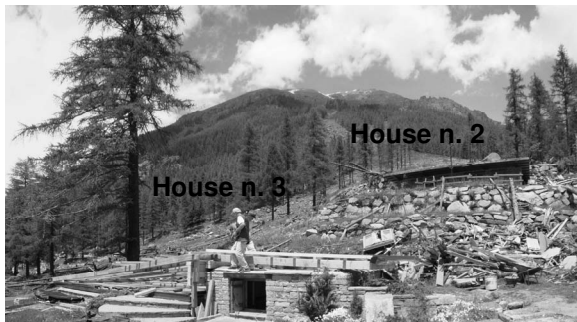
Houses n. 2 and 3 on the run-out zone of couloirs n. 2 and 3 after the event of December 16th: only the ground floors in reinforced concrete frame are survived.
